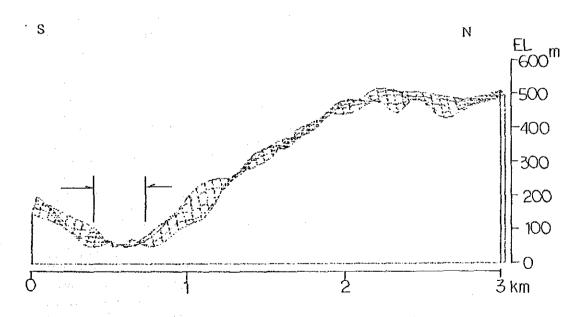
Cross Section along Dam Axis of Bang The Sung Dam Site
